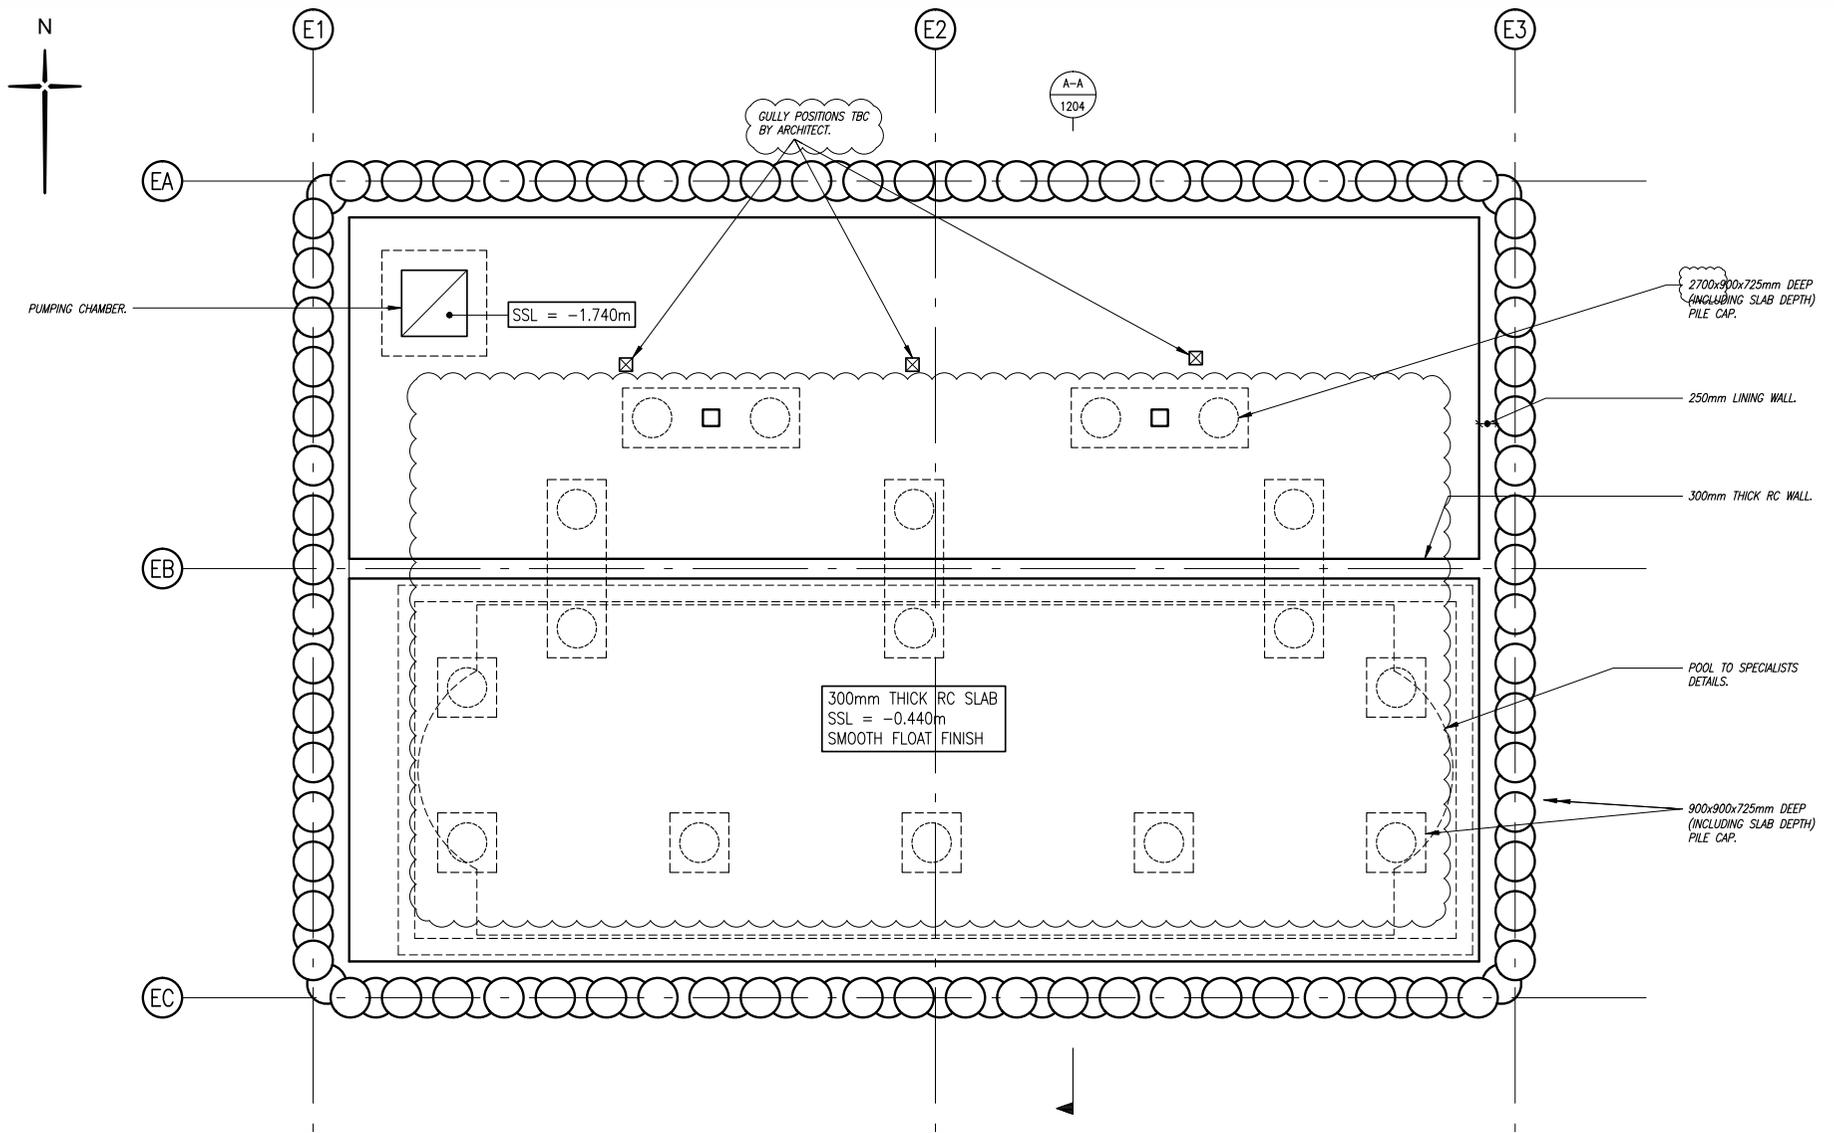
Plan of pile and retaining pile wall locations (Alan Baxter, Dwg no. 1635/20/1125, rev A, January 2015)
